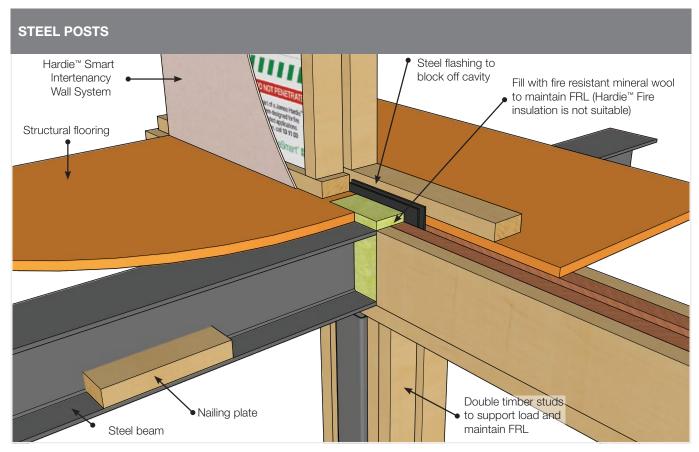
HARDIE™ SMART INTERTENANCY WALL SYSTEM CONTINUOUS WALL FLOOR JUNCTION
